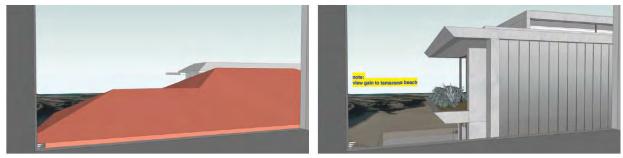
3D render of existing and proposed dwelling as view from Bedroom 2
